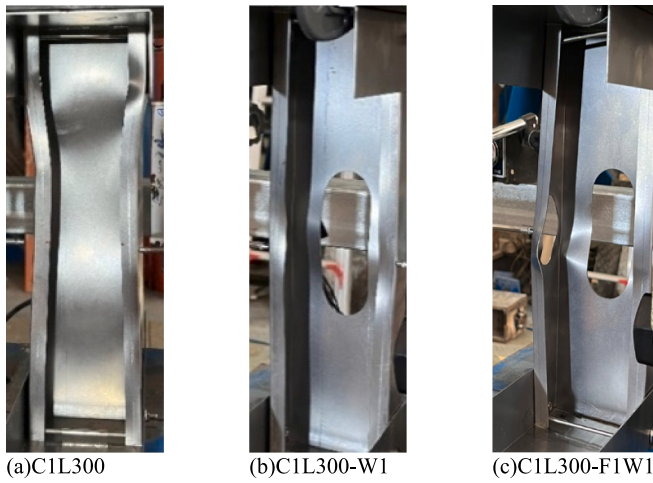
Failure modes of C1-section specimens with a length of 300 mm.
